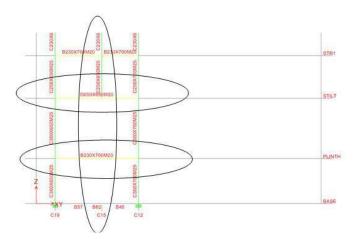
WITH FLOATING COL 15 AND GIRDER BEAM
